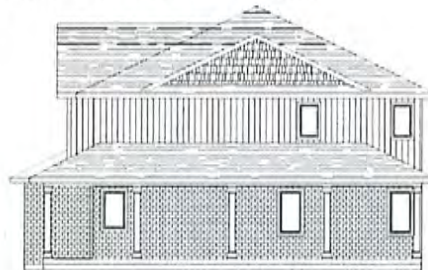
Proposed Building Elevations (Four Unit and Three Unit Multiple Attached Dwellings)
